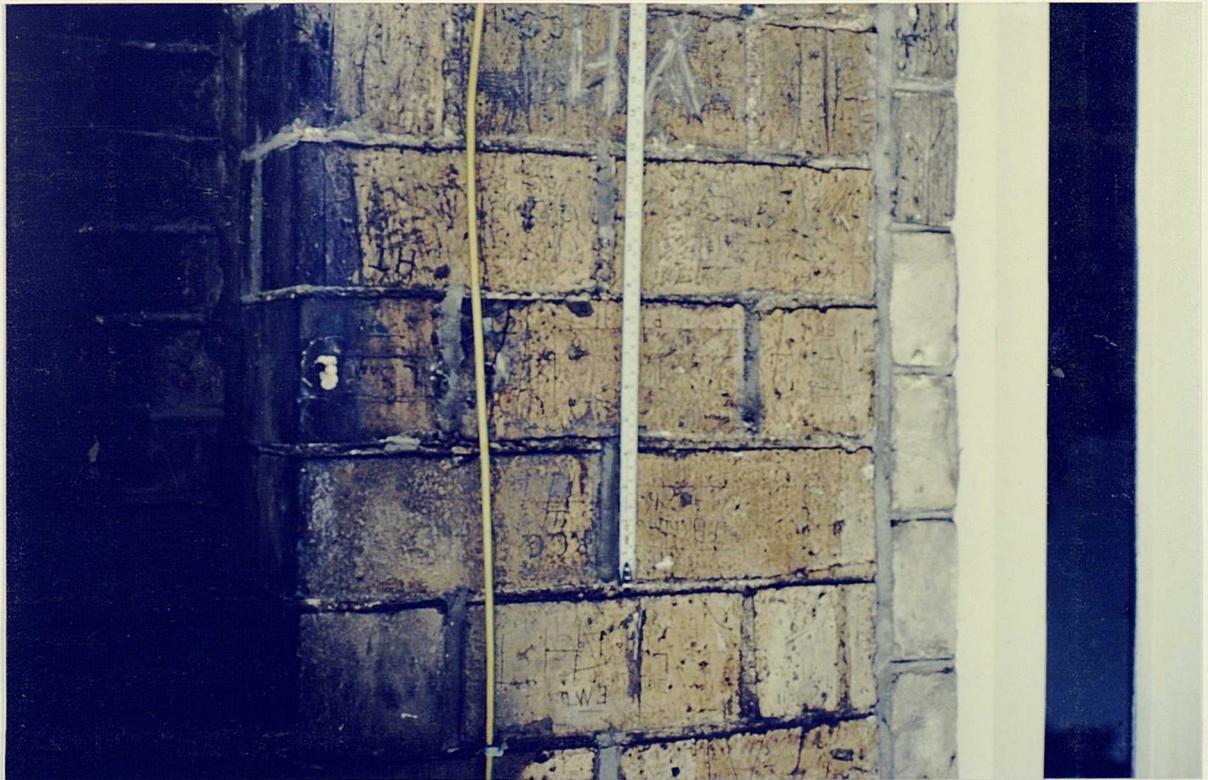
(top) and 10.11. (bottom) Porch constructed of hollow bricks in building at Banham, Norfolk (top). Close-up (bottom). [Photographs by author]
